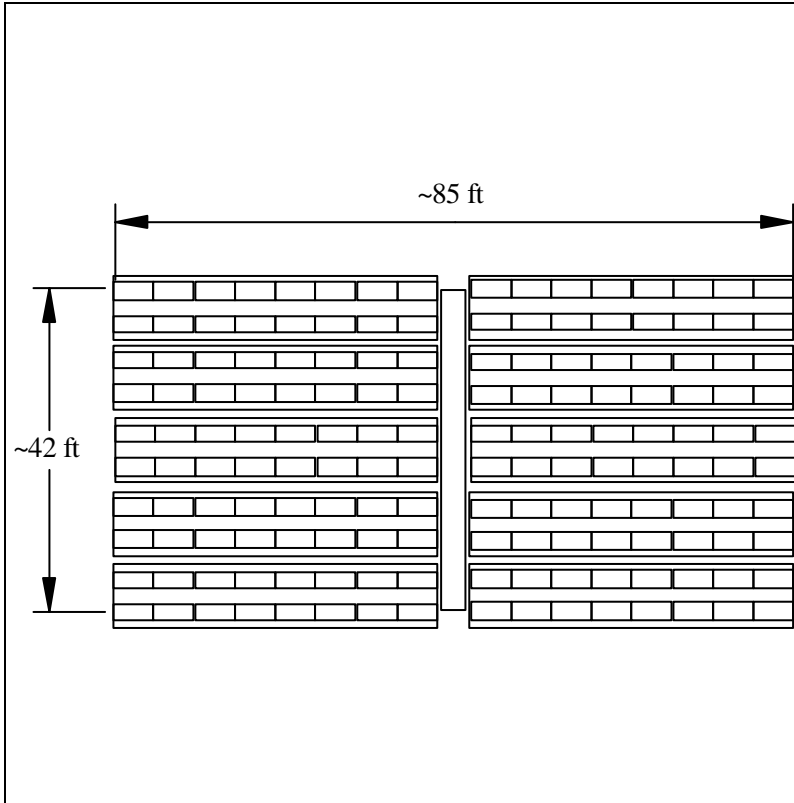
27KW 10-unit PV Raft w/ Joiner Layout & Dimensions
